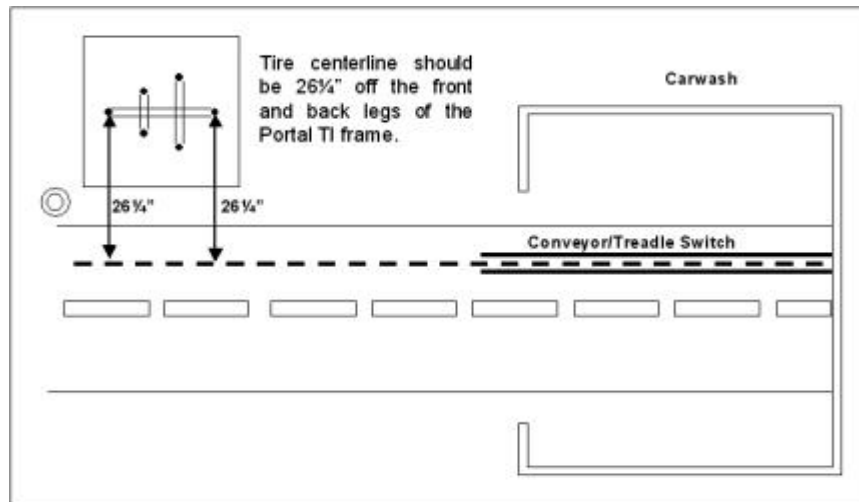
Positioning the Frame – Standard Installation, Pre-existing Slab
